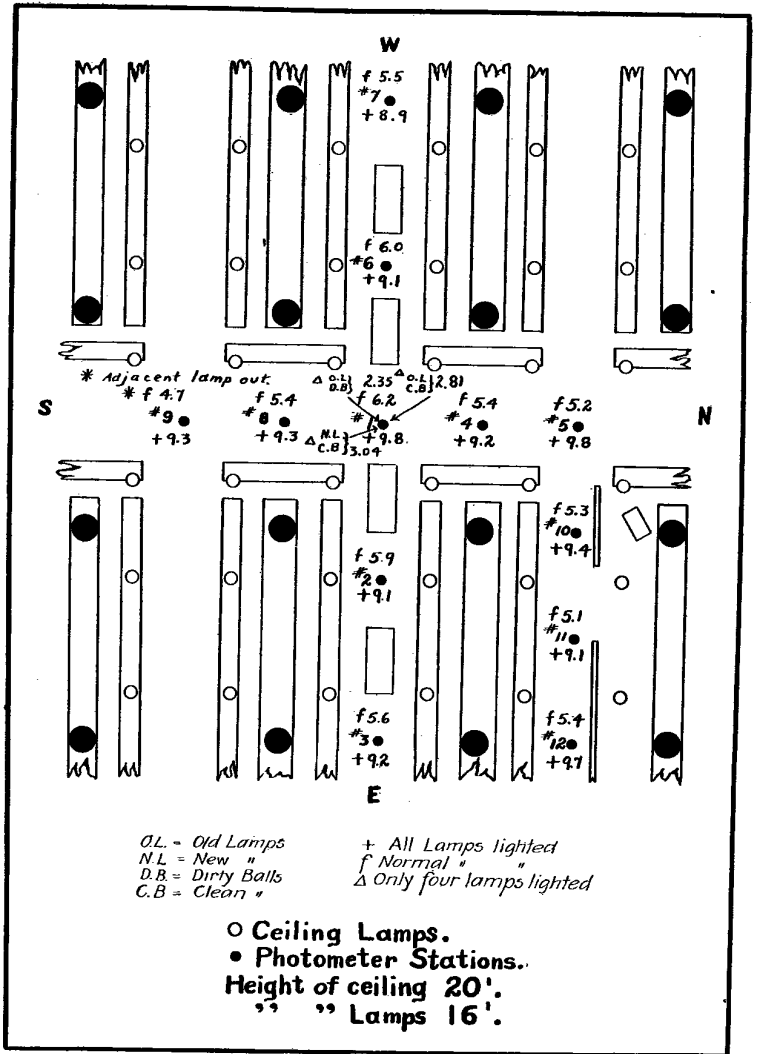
Section plan of main floor, showing location of furniture, pillars, lighting units, test stations and illumination data.
